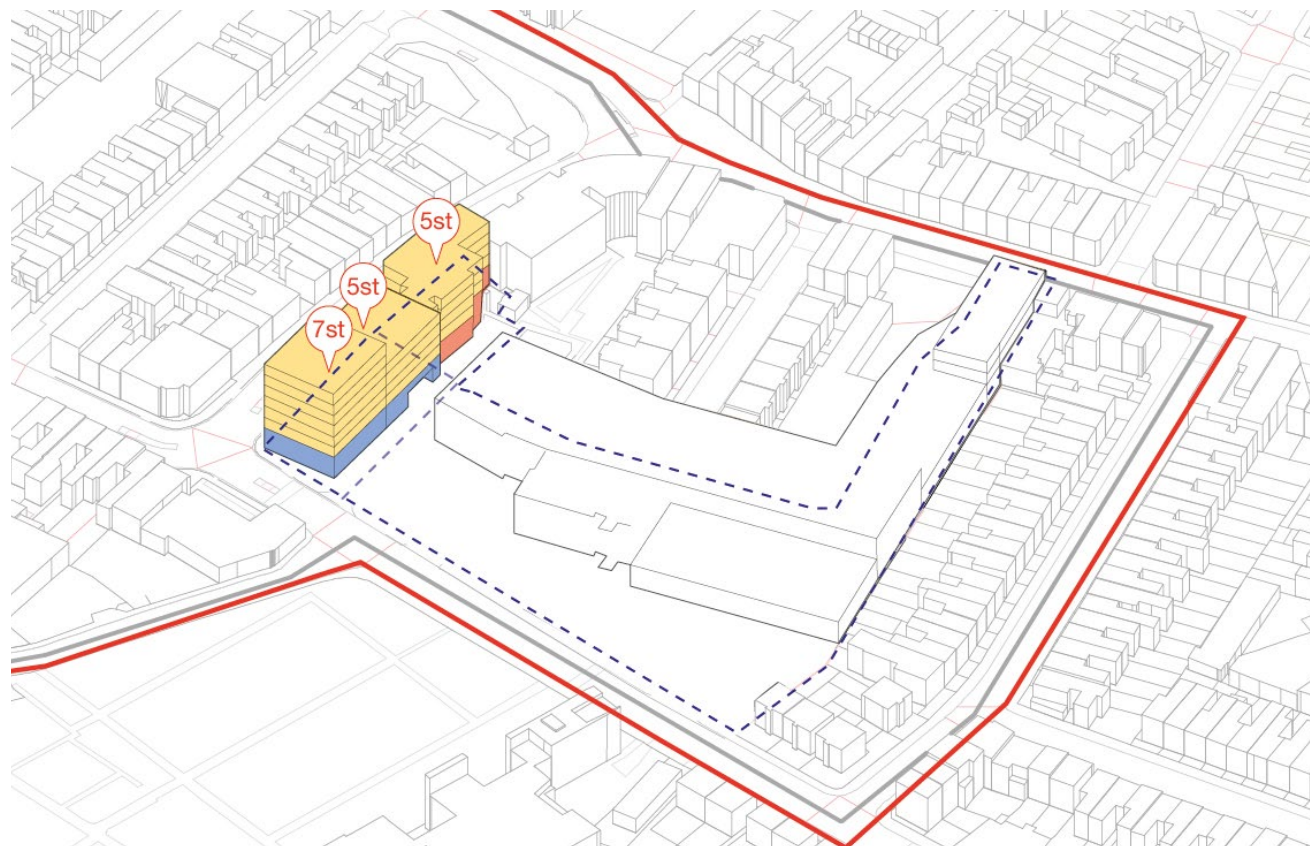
Proposed Massing BSSA5 indicating 5-7 storeys facing the High Road. Hawkins\Brown Masterplan Report
